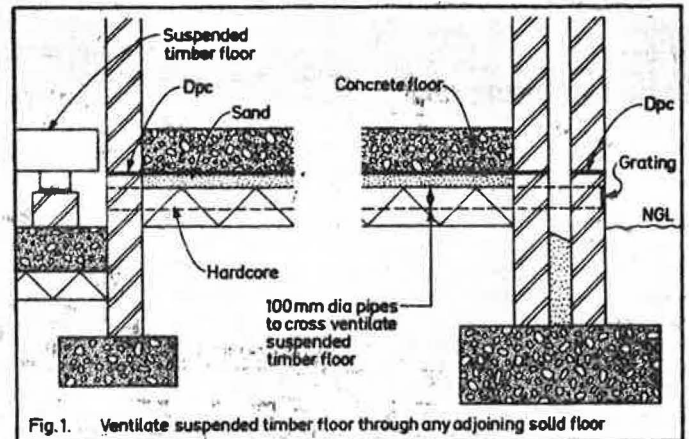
Ventilate suspended timber floor through any adjoining solid floor
